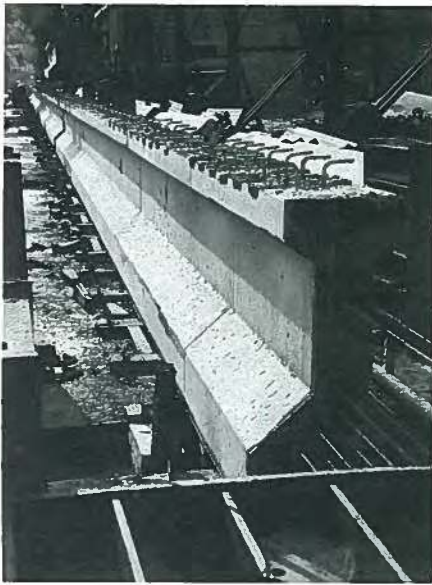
1953 pretensioned girder for Garden State Parkway, New Jersey cast without end blocks, contrary to Bureau of Public Roads' requirements.
